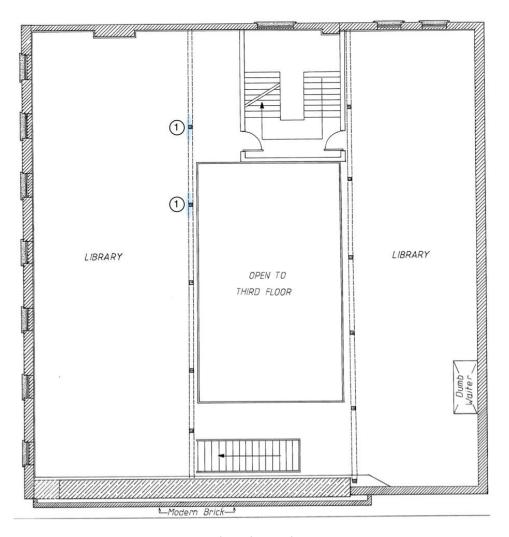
An annotated copy of the fourth floor plan. North is to the top.
